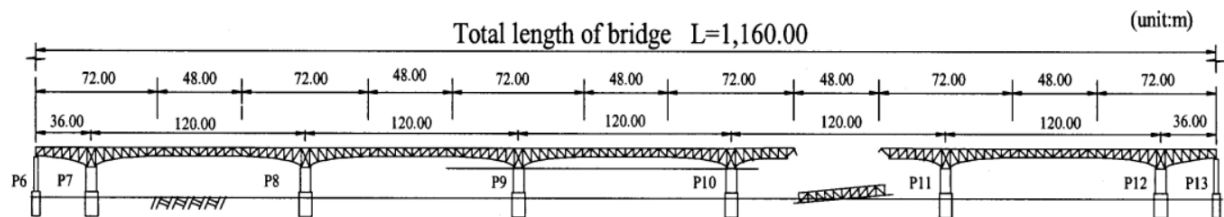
Elevation view of the collapsed Sungsoo Grand Bridge (Cho et al., 2001).
